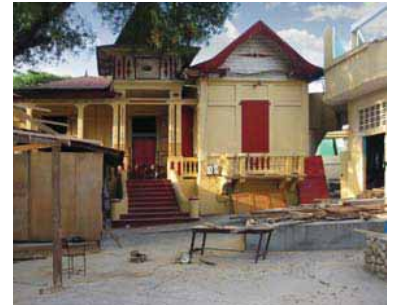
Concrete frame/confined masonry Gingerbread. This is the only variant of this type seen. It was undamaged.
